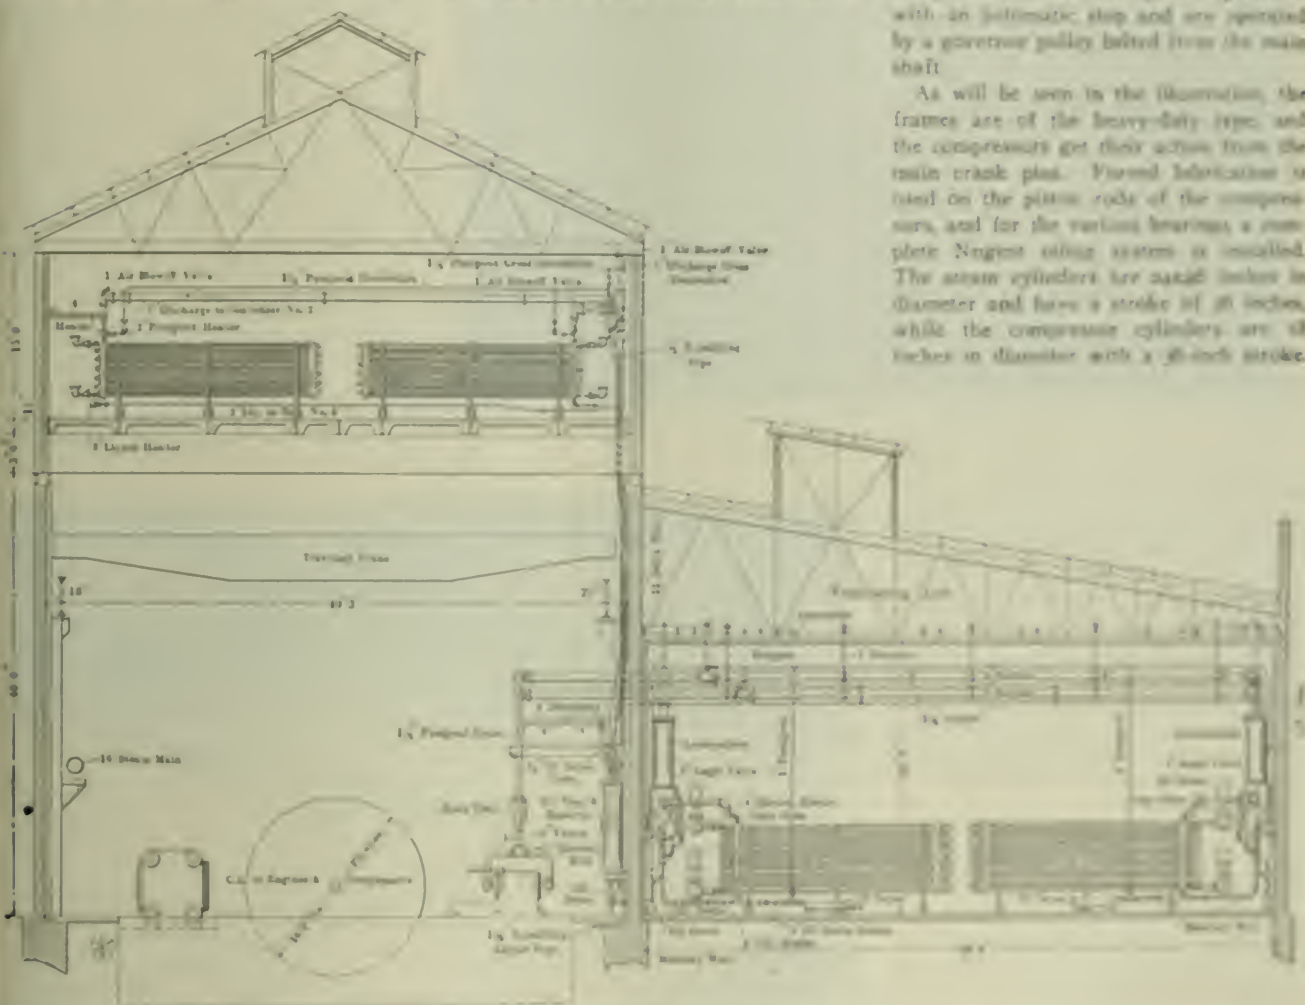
ELEVATION THROUGH REFRIGERATING PLANT
